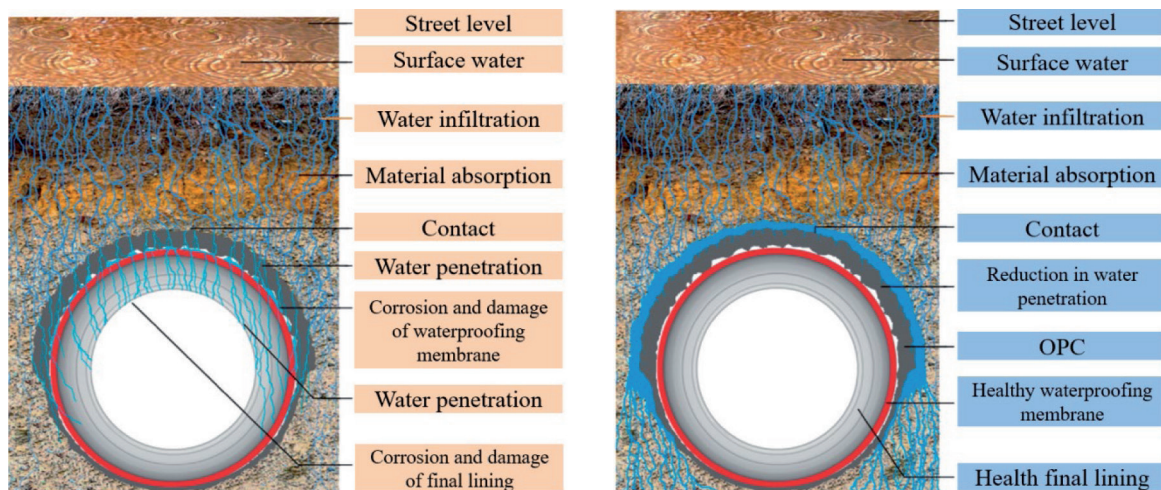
Organic polymer concrete in tunnel waterproofing [75].
